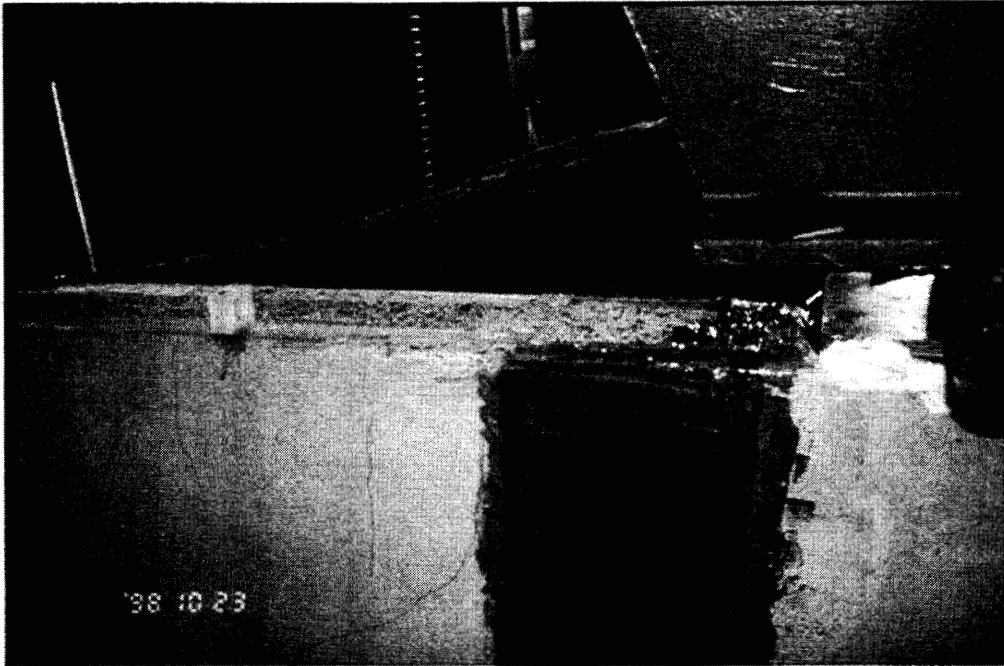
Failure of transverse wrap and debonding of laminate (Beam 5)
